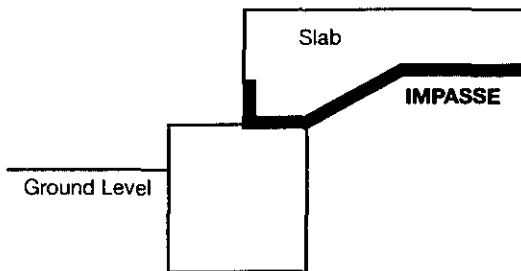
Shows Impasse Barrier installed between the slab panel and edge beam of a non-monolithic slab.
